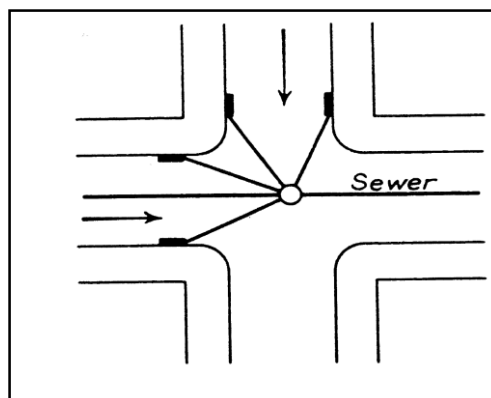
Gully inlets at street corner and the short branches enters a manhole.
